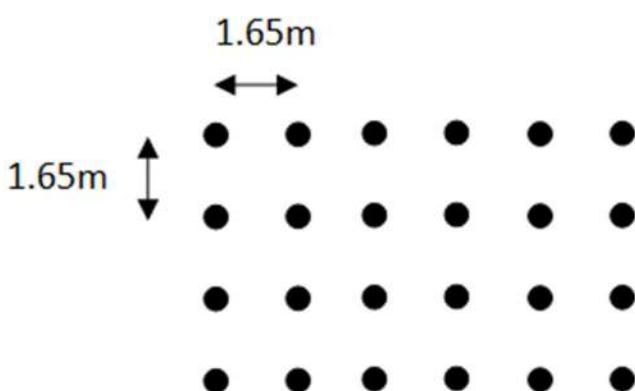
Section of pile plan. The whole pile plan is 7x76 piles all with a c.t.c. distance of 1.65 metre.
